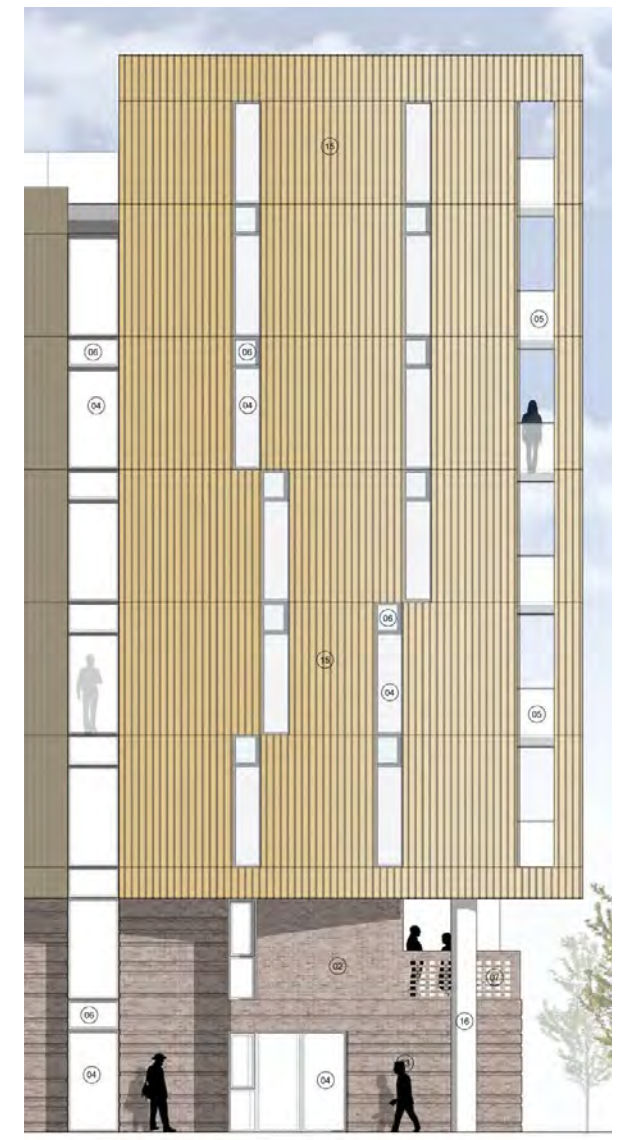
Elevations of The Rushgroves Site to the North of Application Site
